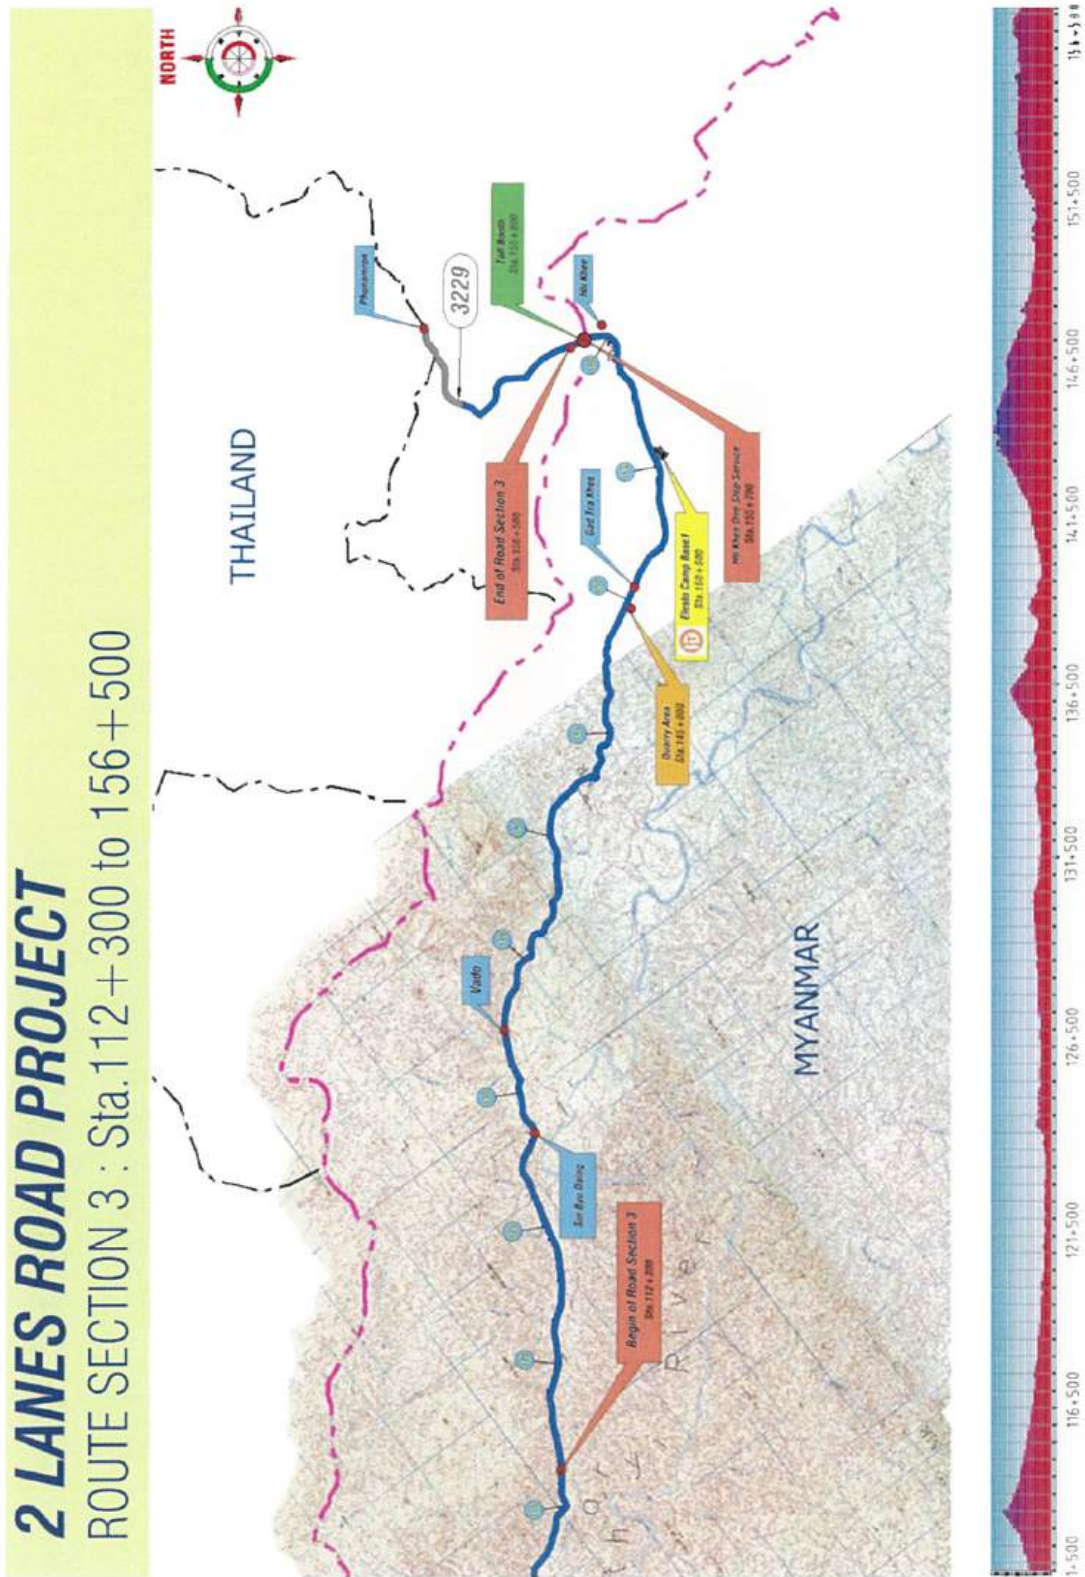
THE TWO-LANE ROAD PROJECT-ROUTE SECTION 3 (KM 112+300-156+500)
